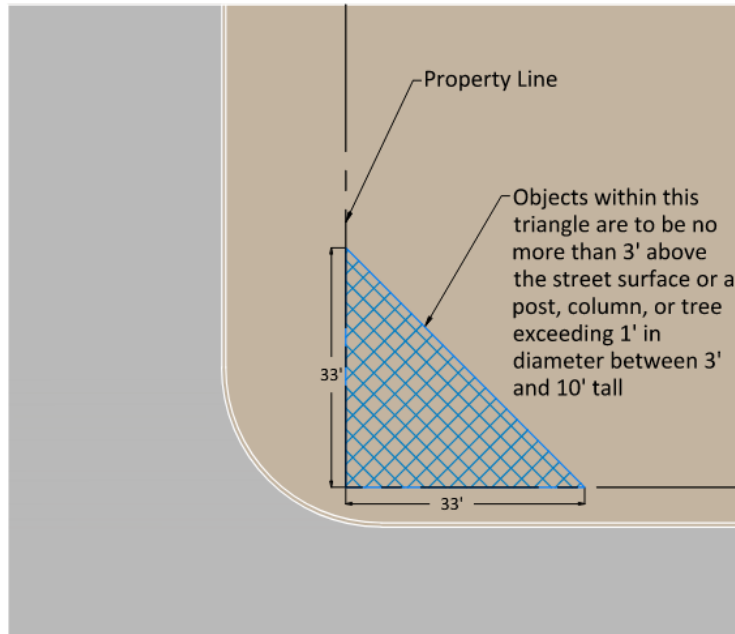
Street Intersection Sight Visibility Triangle
